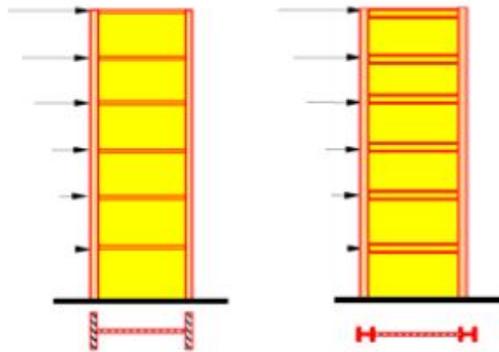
Steel shear wall on the right hand side and beam sheets on the left hand side
